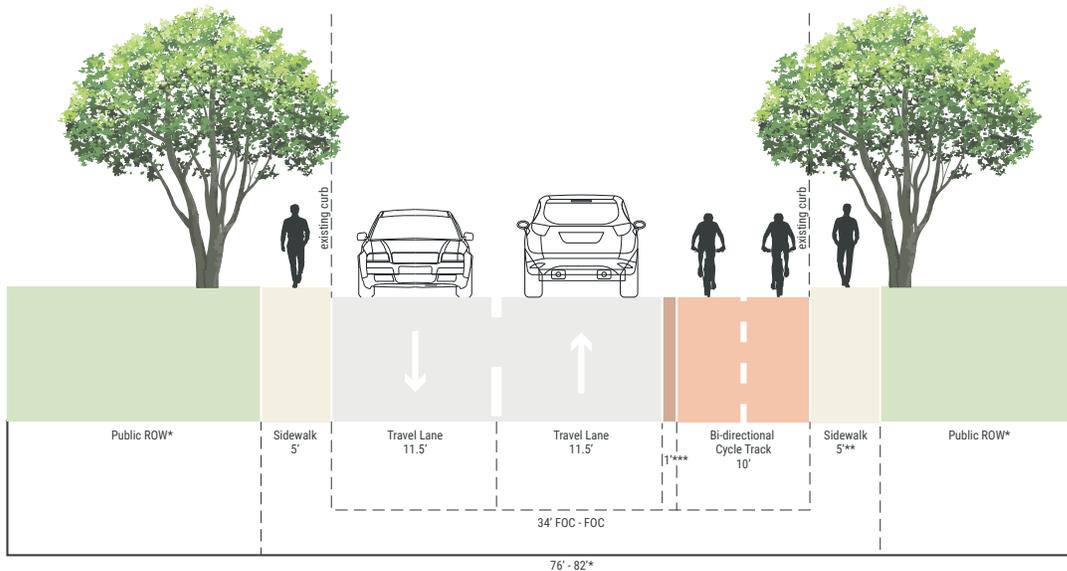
EXISTING CHESTNUT STREET / 3RD STREET CROSS-SECTION
